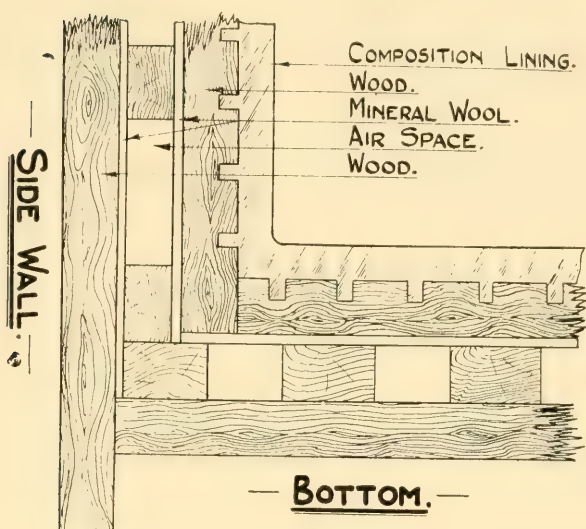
TYPICAL REFRIGERATOR WALL CONSTRUCTION
